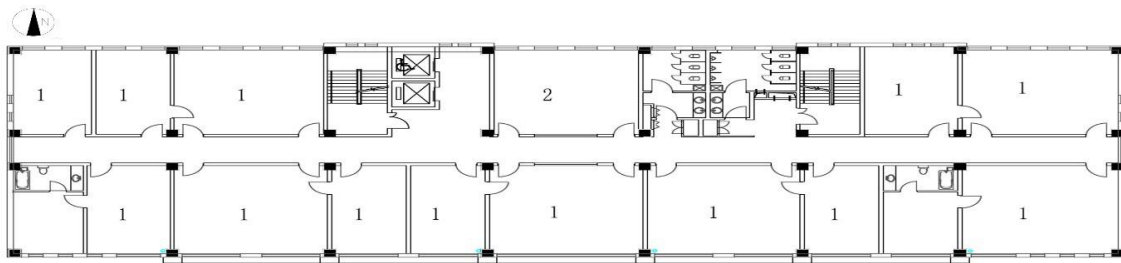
Typical floor plane of building (1-Office, 2-Anteroom).
